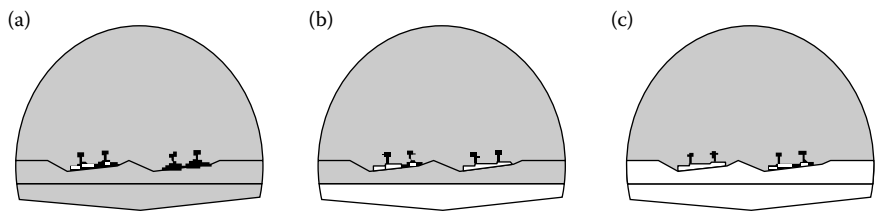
Cross sections of railway tunnels: (a) excavated, (b) effective, and (c) useful.
